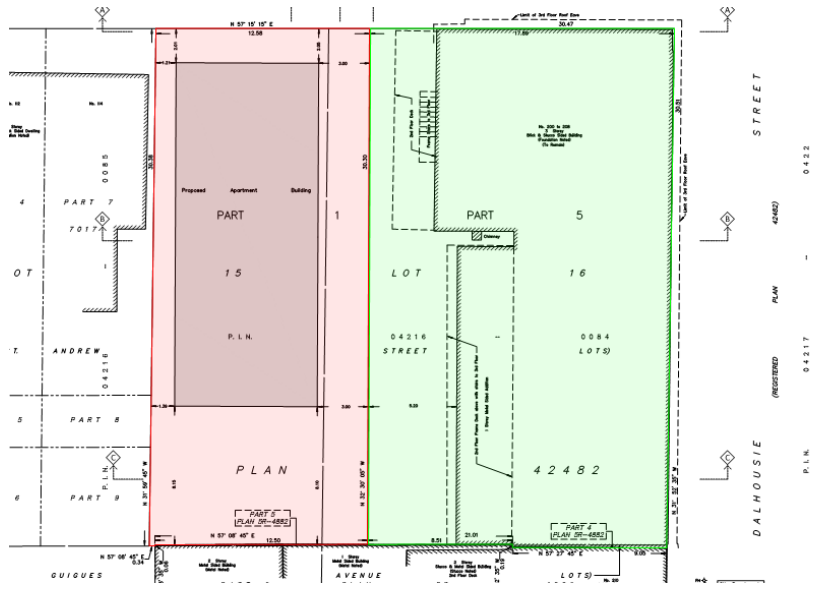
Consent Applications, Elevation 72.00 and Above (no easements proposed at this elevation)
